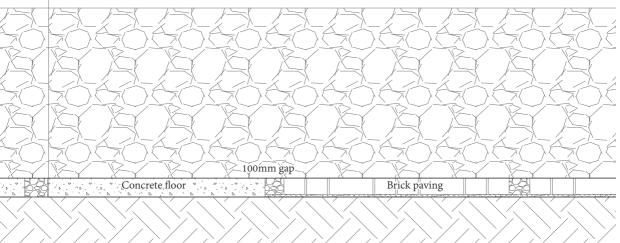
Detail C1:paving detail continue 1:20 scale (Author 2017)
